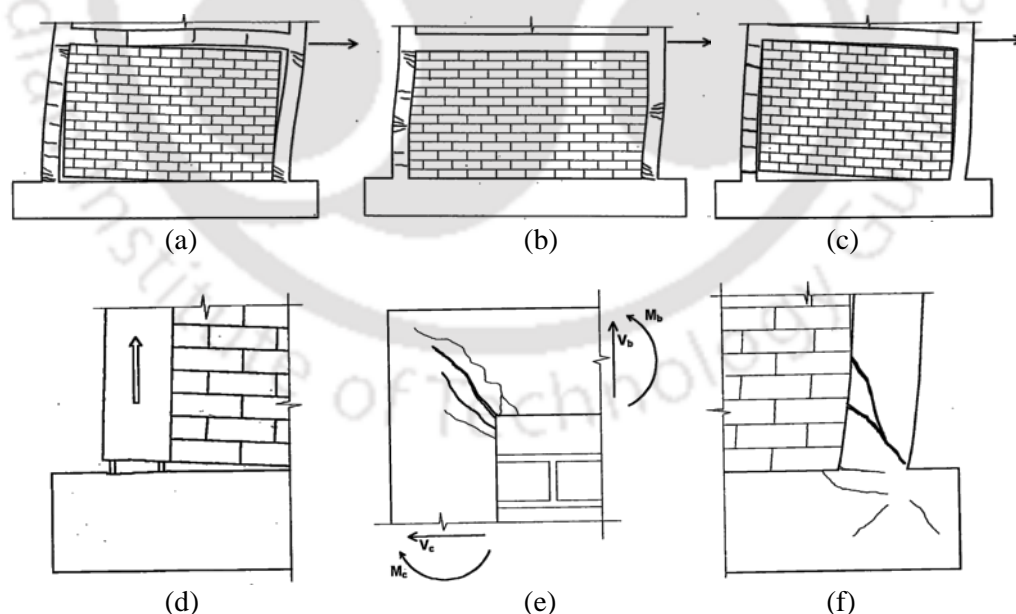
Failure in frame members: (a) and (b) flexural hinges at member ends and span length, respectively; (c) tension failure; (d) bar anchorage failure; (e) beam-column joint failure; and (f) shear failure of columns (Crisafulli 1997).
